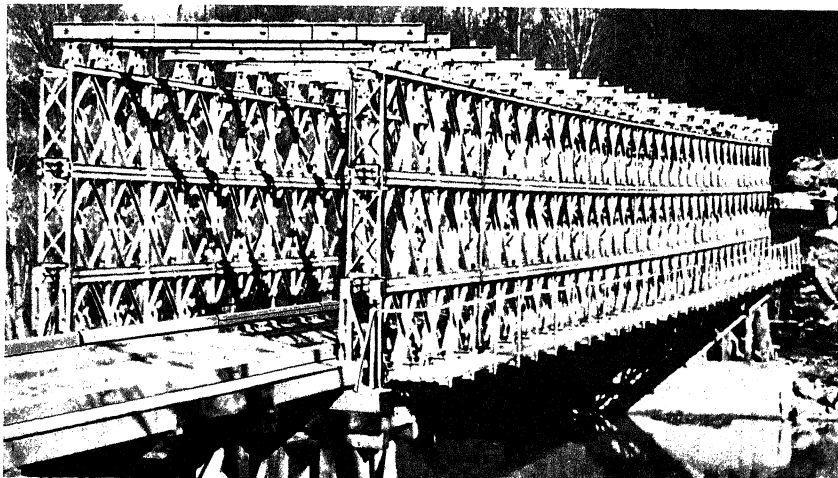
Triple-story bridge with all three stories above the floor system.
